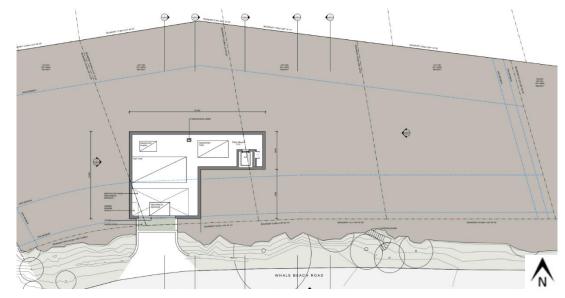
Proposed plant room and elevator shaft, Extract from Basement Plant Floor Plan (Source: Drawing No. 1101, Rev. A)
